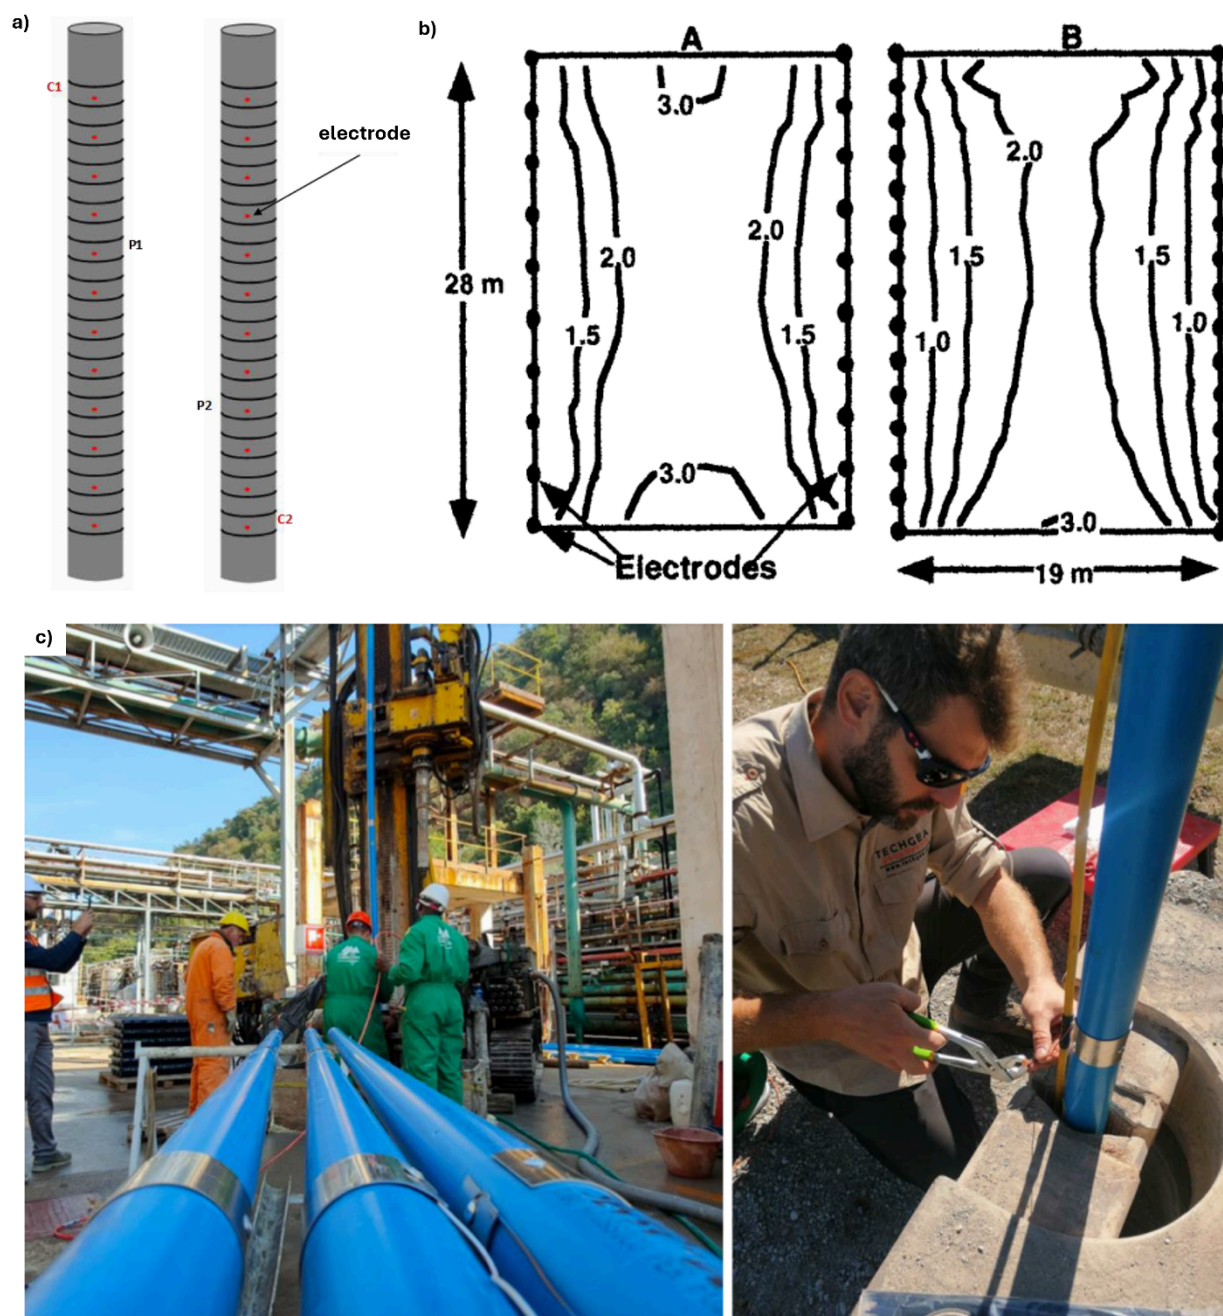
Electrode layout in cross-hole ERT method (a) with details about vertical and lateral resolution in meters (b, modified from LaBrecque et al., 1997) and on-site installation (c, with permission from Techgea).
